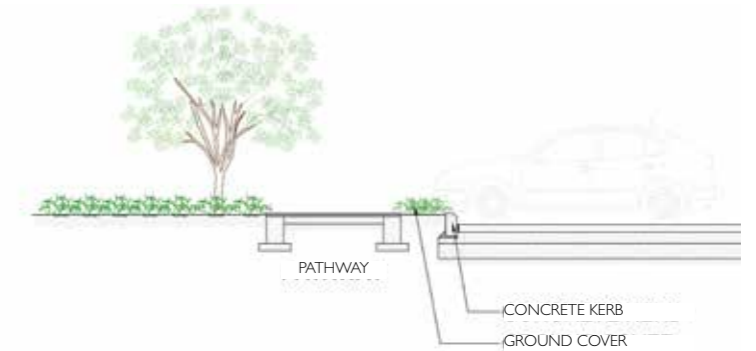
Parking Lot Kerb-150mm. high kerb adjacent planted area (County of Los Angeles : Department of Parks and Recreation Planning & Development Agency, June 2014, p.15)
